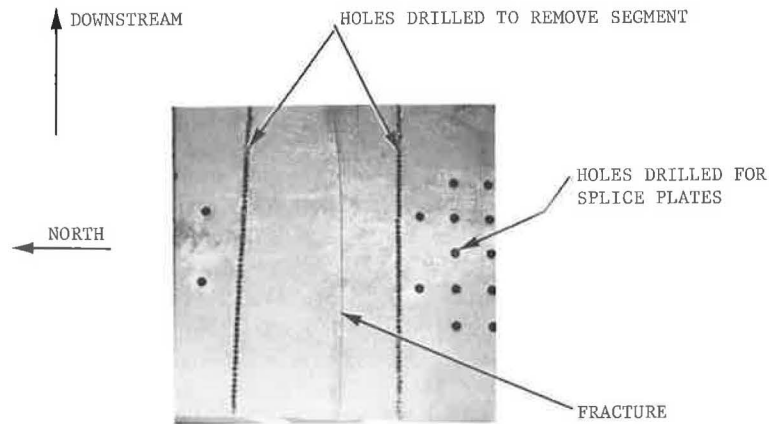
Plan view of top flange, showing fracture.
